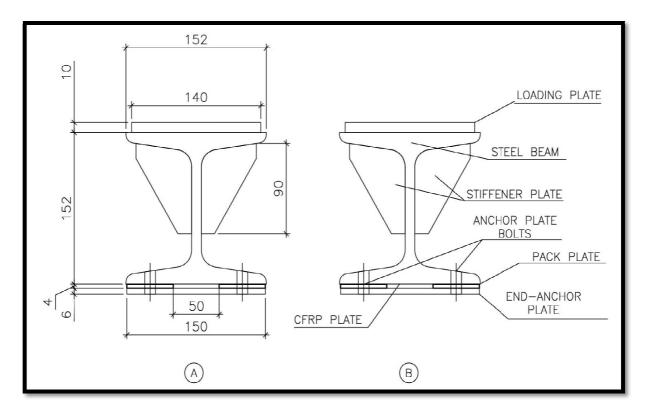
A: Dimensioning Details of Strengthened Test Beams with End Anchorage.B. Component Details of Strengthened Test Beams with End Anchorage. (Beam 3, Beam 7, Beam 8 and Beam 9)
